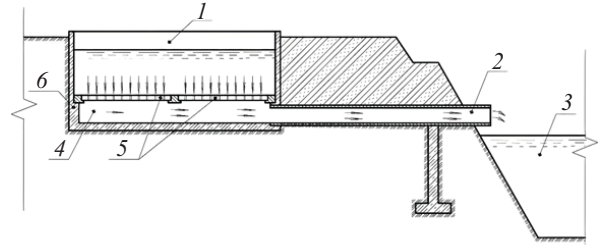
Scheme of a water intake structure from a mountain watercourse [5]: 1 — water collector of intake structure; 2 — tubular drains; 3 — water intake basin of irrigation system; 4 — catch gallery; 5 — filter panels of water intake; 6 — abutments
